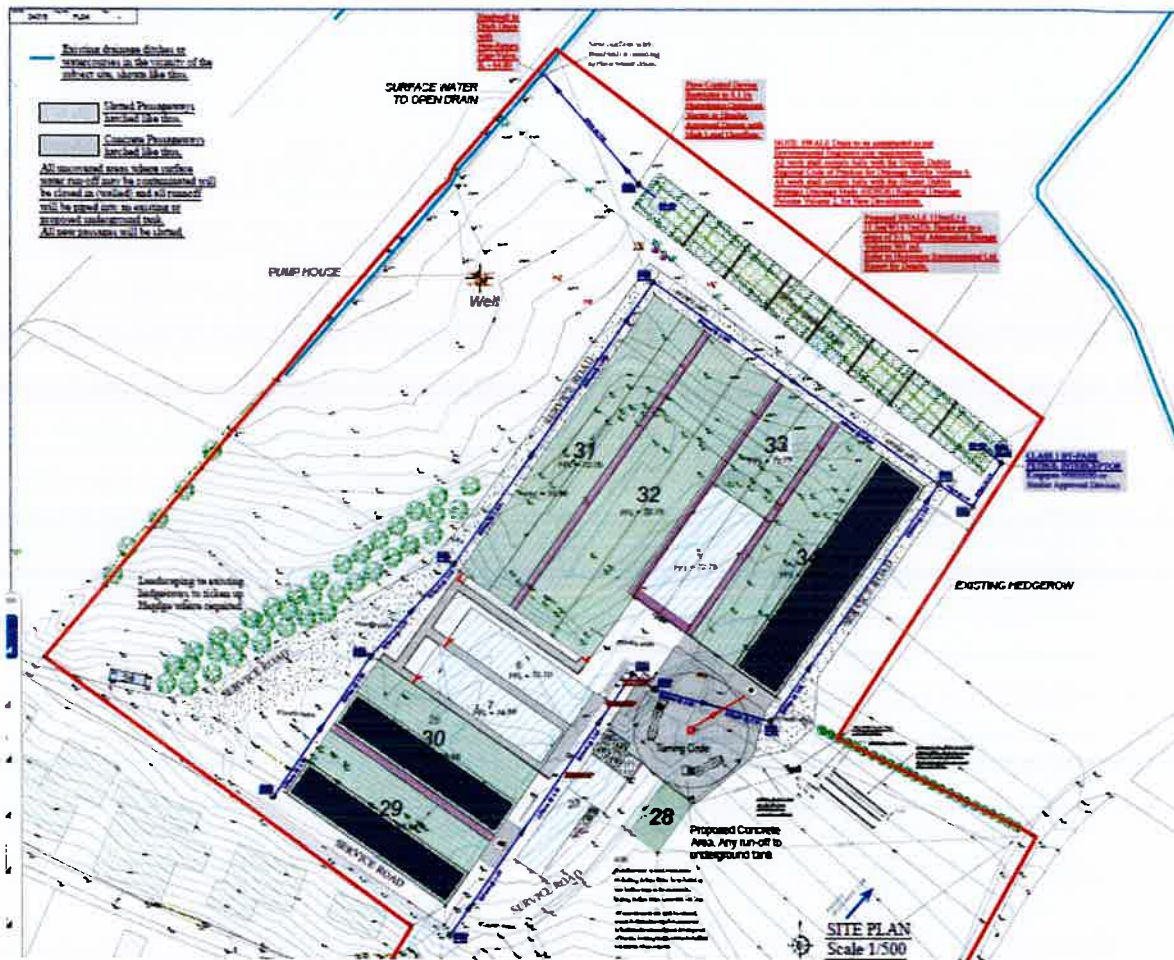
a Site Plan section detailing proposed attenuation
